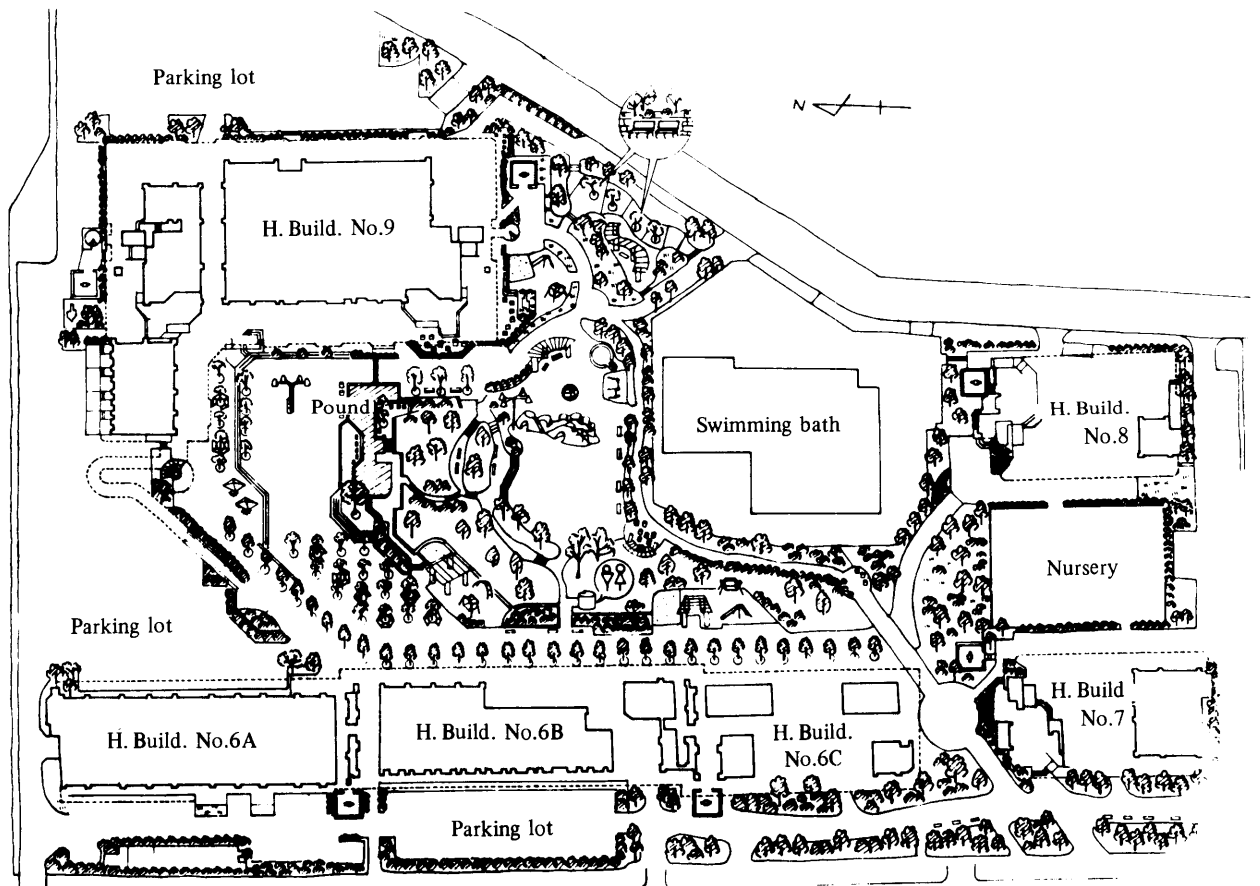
Plot plan of house building in Morinomiya Estate No. 2
